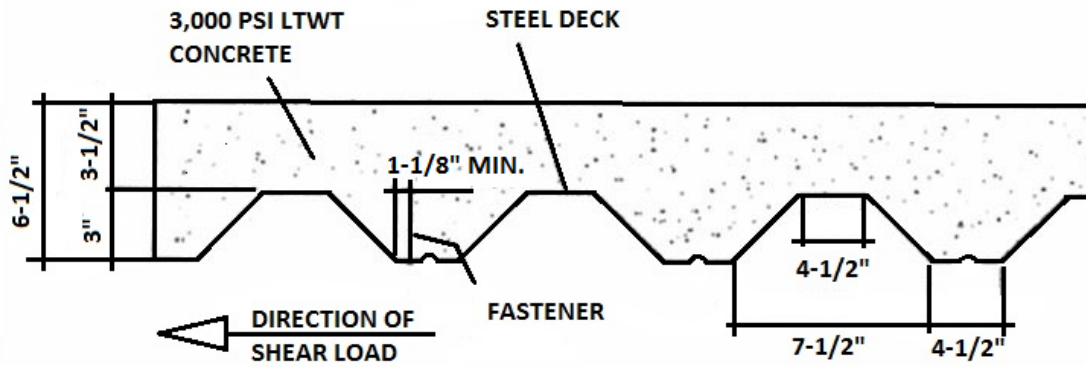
INSTALLATION THROUGH STEEL DECK PANELS INTO SAND-LIGHTWEIGHT CONCRETE
